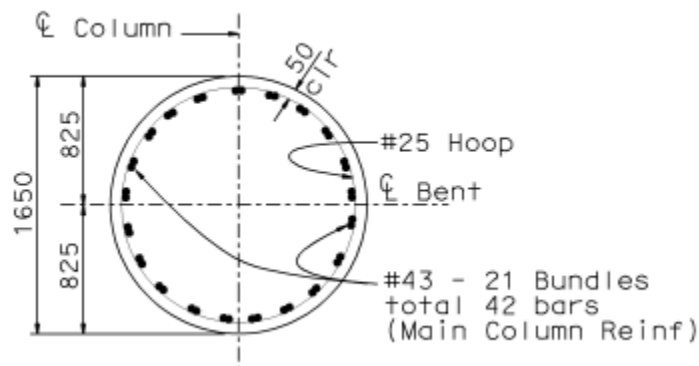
Cross-section detail of R14R bridge column (Caltrans)
